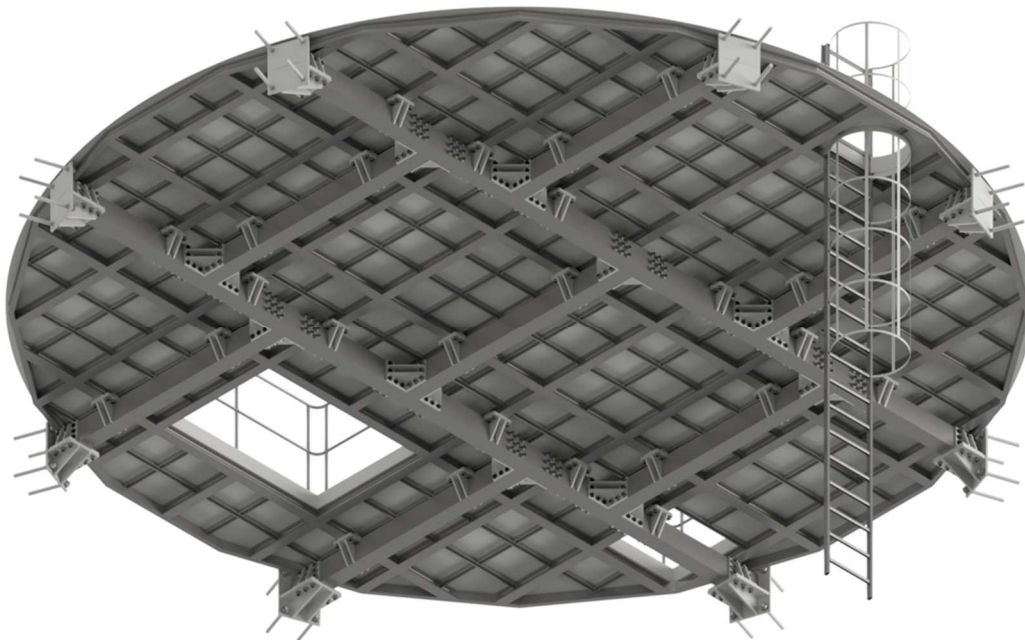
Bottom view of the platform with the bolted frame and girders [2].
